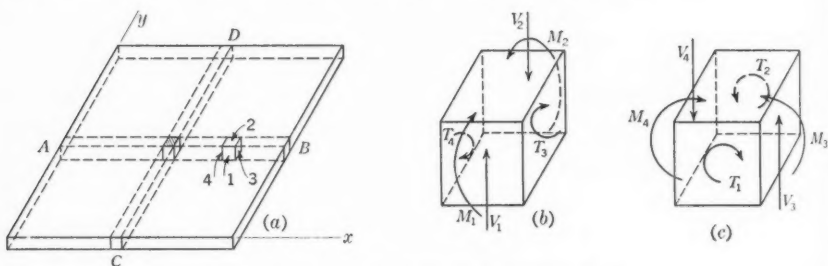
COUPLES ACTING ON AN ELEMENT OF A SLAB
